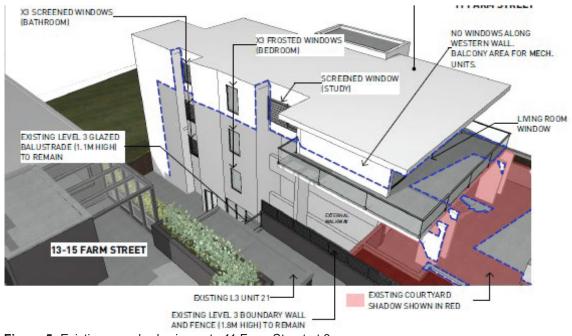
Existing overshadowing onto 11 Farm Street at 3pm.
